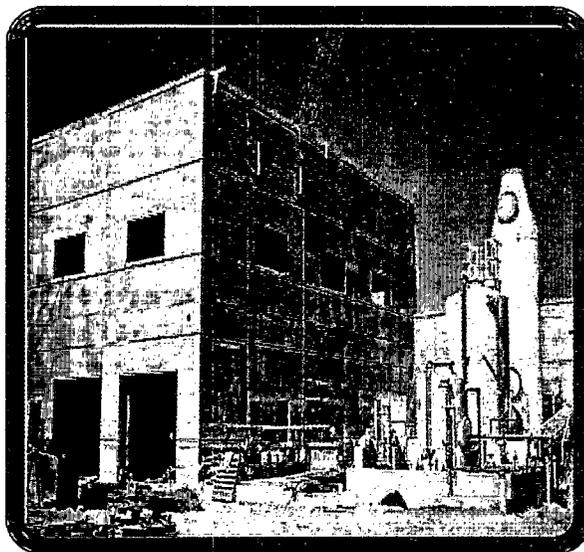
Construction of headworks and odor control building at the International Wastewater Treatment Plant.
